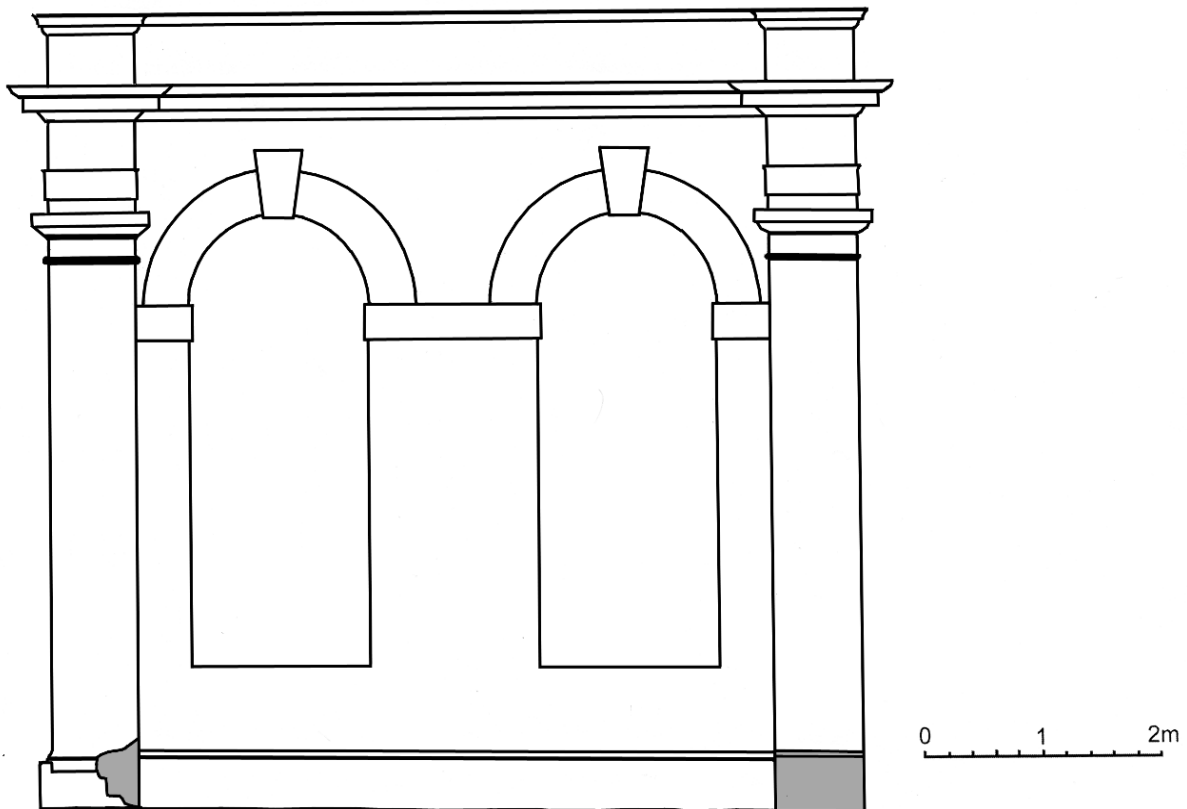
The orangery wall bay 7. The grey areas are damage or poor repairs.
